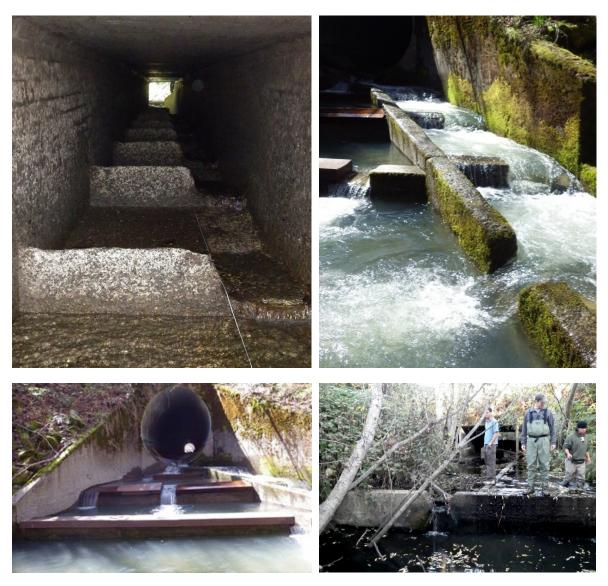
Examples of internal structures and modifications at road crossings in the Eel River basin. Internal baffles (top left; Fish Creek, PAD 707157), step-pool fishways at outlet (top right and bottom left; Elk Creek, PAD 707107), and tailwater control weir (bottom right; Rohner Creek at 12<sup>th</sup> St. in Fortuna, CA).
